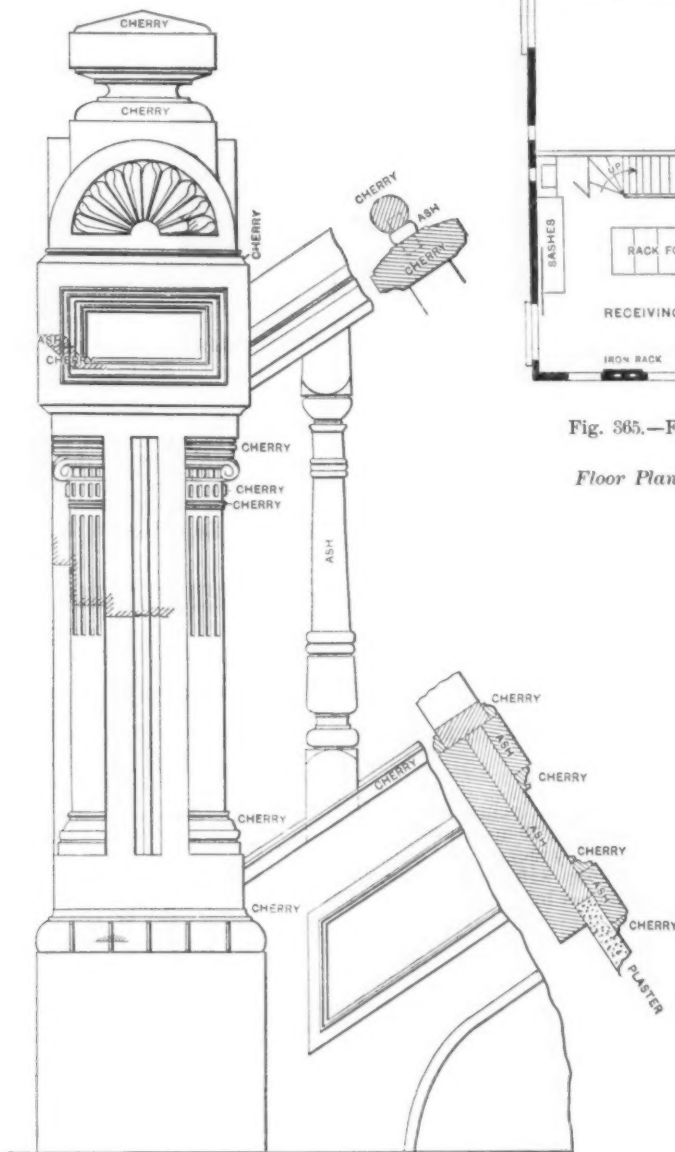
Finish of Stairway Leading to Second Floor of Store.—Scale,  $1\frac{1}{2}$  Inches to the Foot.
